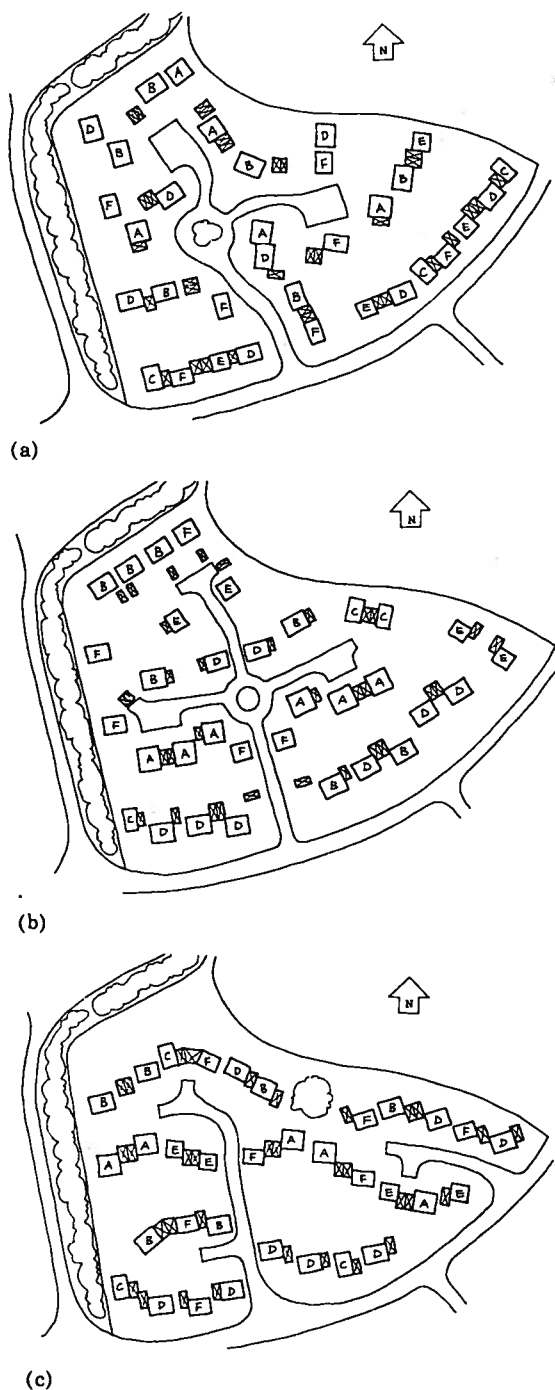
Conventional and passive solar site layouts (ETSU). (a) The original estate of detached houses. (b) MCJ's improved layout. (c) SEF's improved layout.
